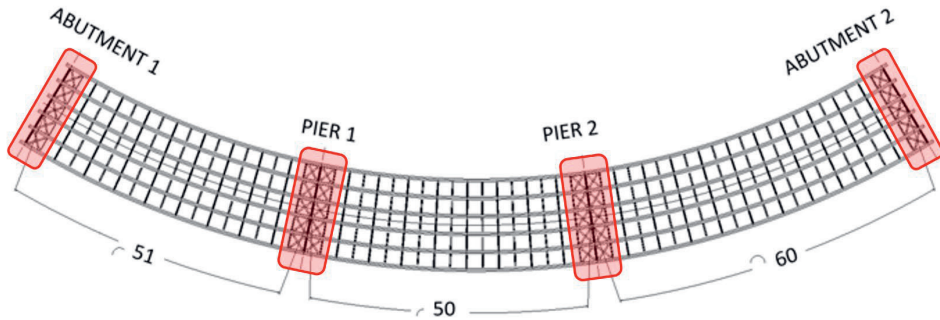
Plan-overview of the distribution of the lateral bracing between the lower flanges for the existing bridge. (Paper V / Vestman et.al., 2023)
